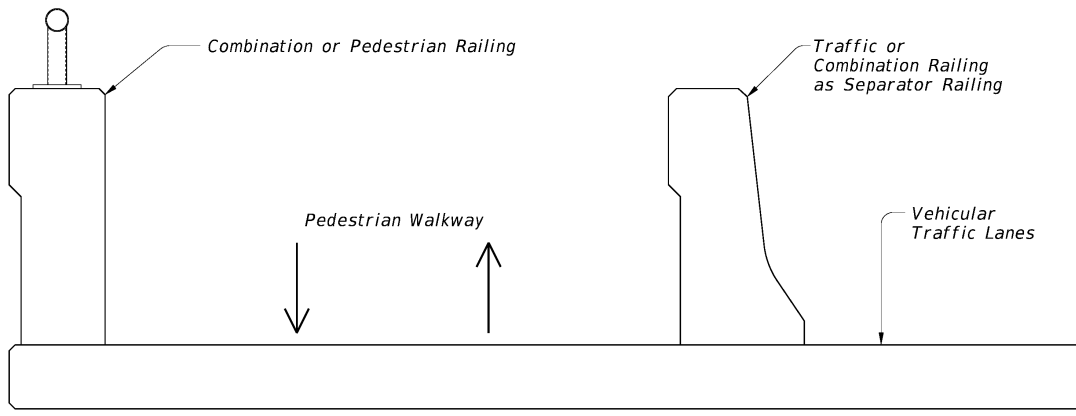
Bridge railing for vehicular and non-vehicular traffic – high speed
